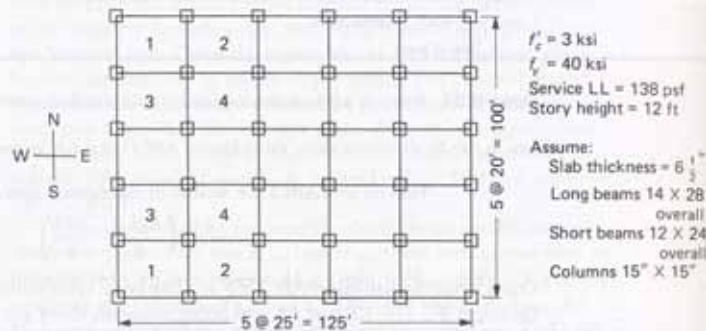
Floor plan in design example for two-way slab with beams.
